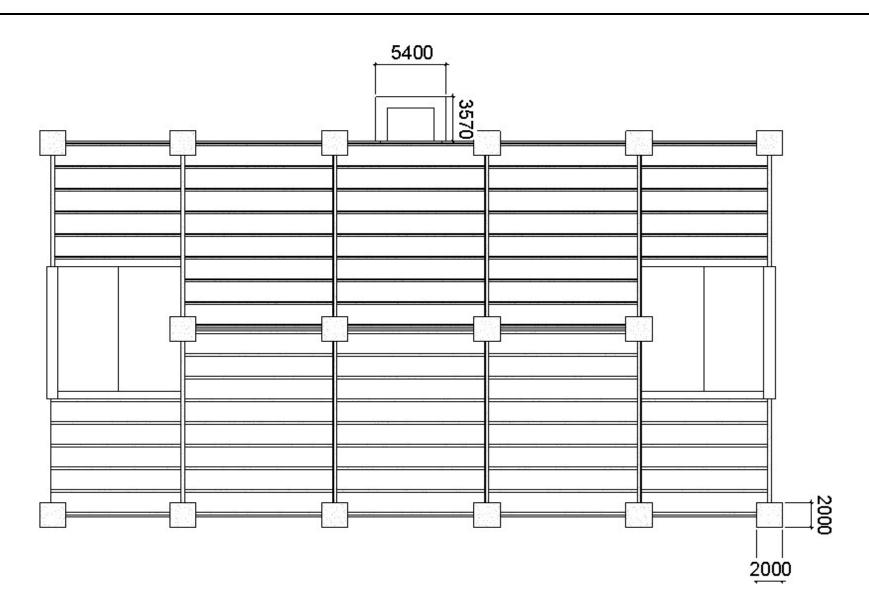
The structural support system of the parking garage including foundation pads and support beams
